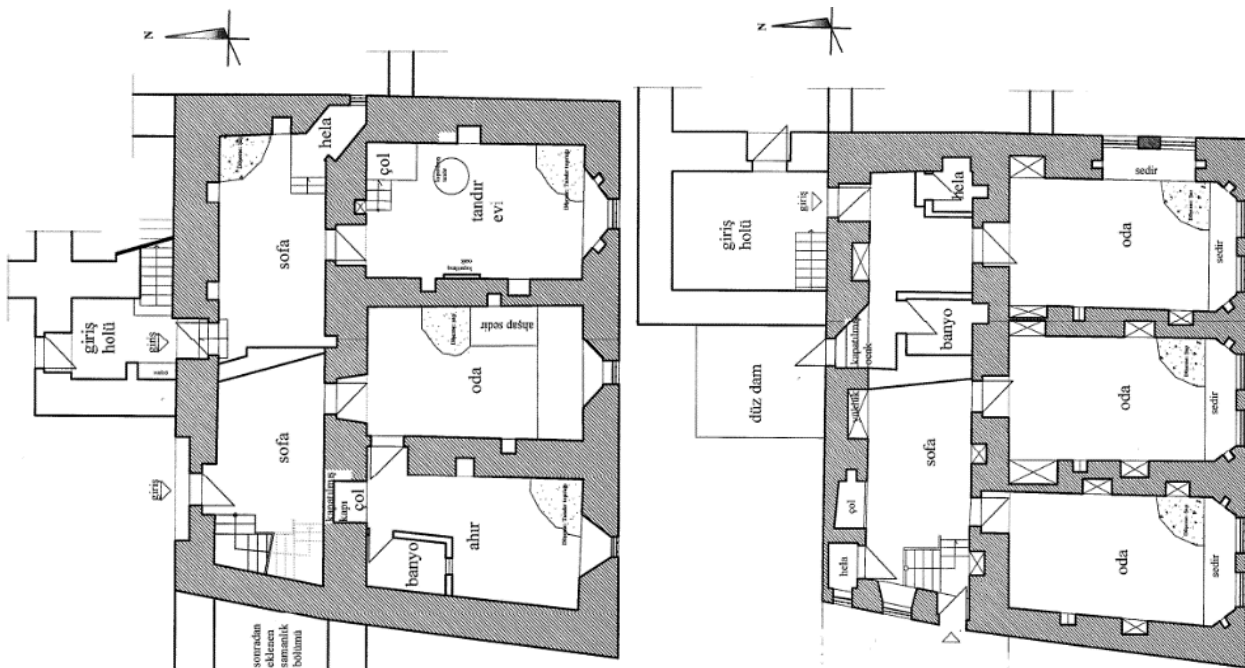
Mahmut Aksüt House Ground Floor Plan(left), 1<sup>st</sup> Floor Plan(right) (Karakuş, 2008)
